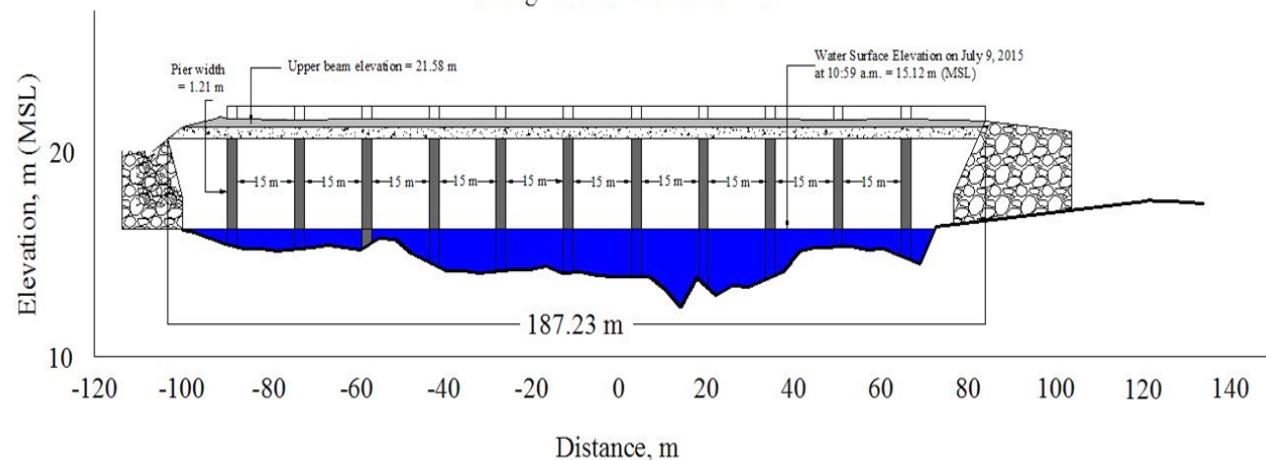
Bridge cross-section diagram of the Guesset Bridge
